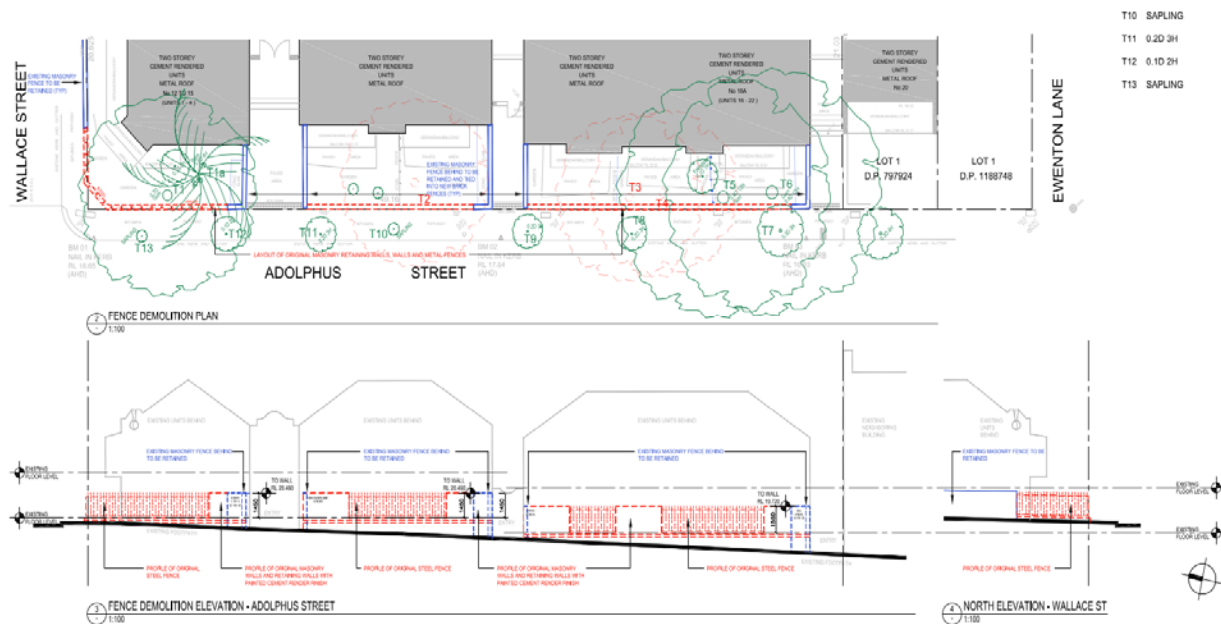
Proposed tree removal and demolition of retaining wall/ front fence at 18A Adolphus Street, Balmain
